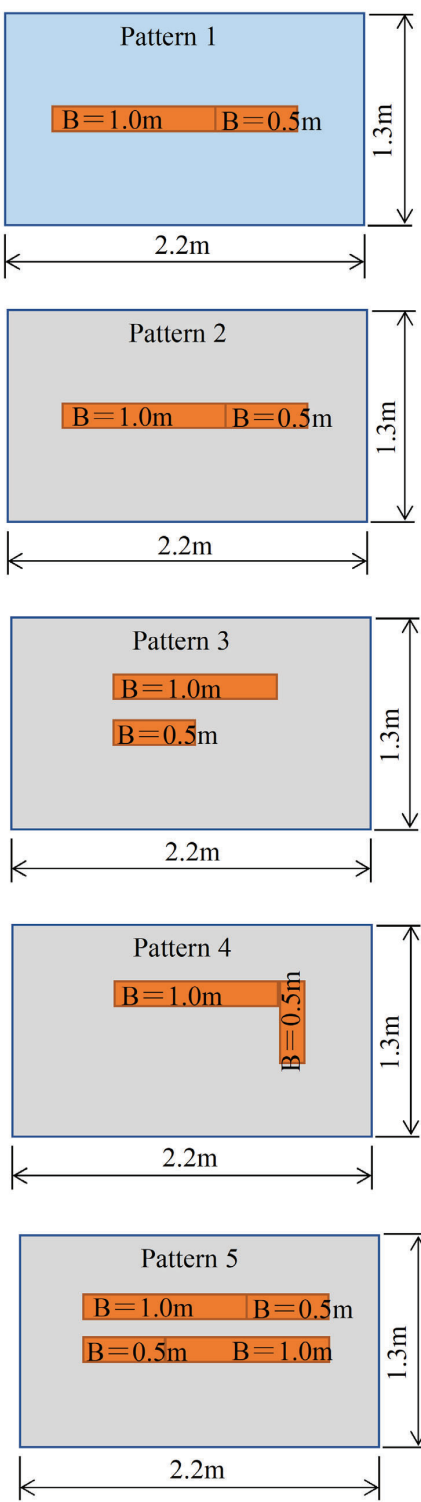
Plan view of the CLT arrangements for full-scale experiment
